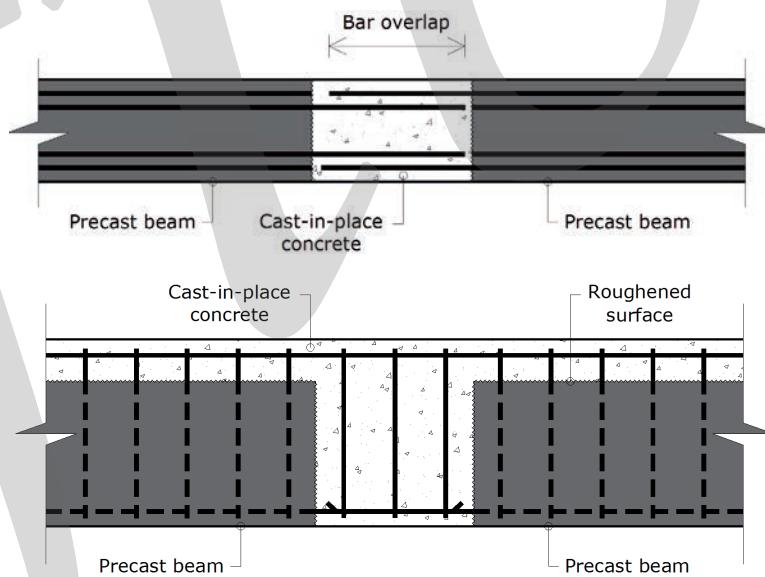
Beam-to-beam connection with noncontact straight-bar laps
